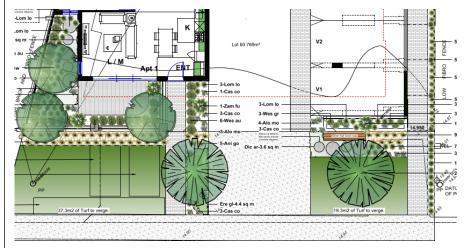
Extract of the proposed landscaping plan showing front setback area.
